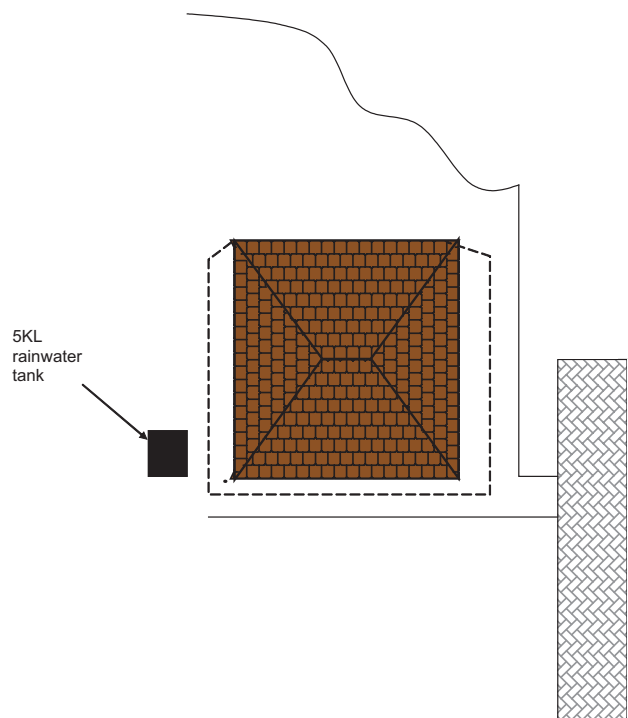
Site layout of an infiltration system to treat stormwater runoff from a residential allotment in Venus Bay.
